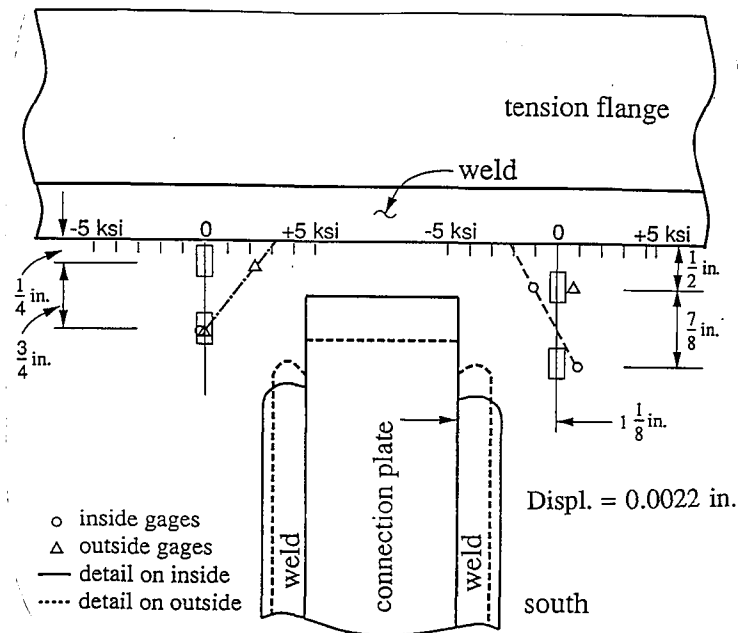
Static Stress Distribution on Inside Girder at Pier S7-12 (96 in. Girder) Before Retrofit with Dump Truck in Outside Lane (Worst Case)
